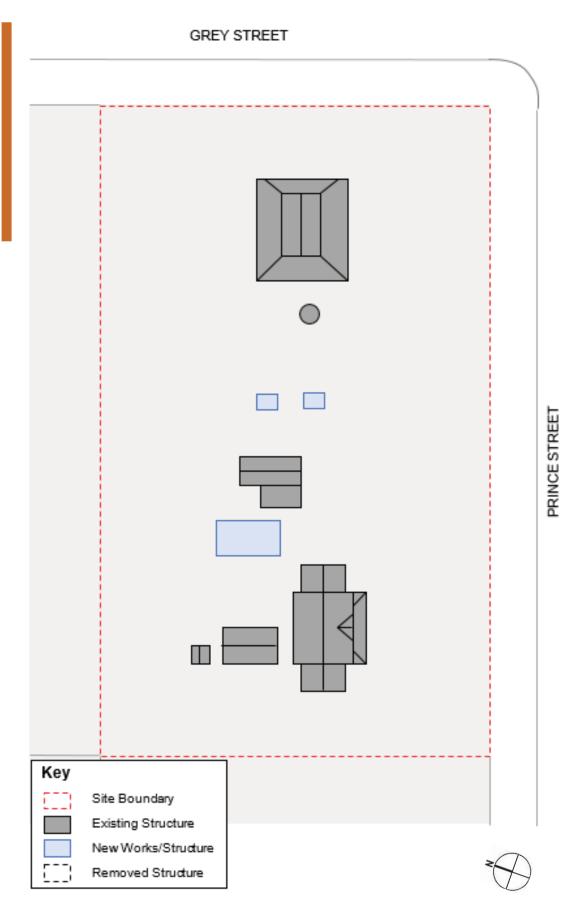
Clarence Town Courthouse and site period of construction - 1986
